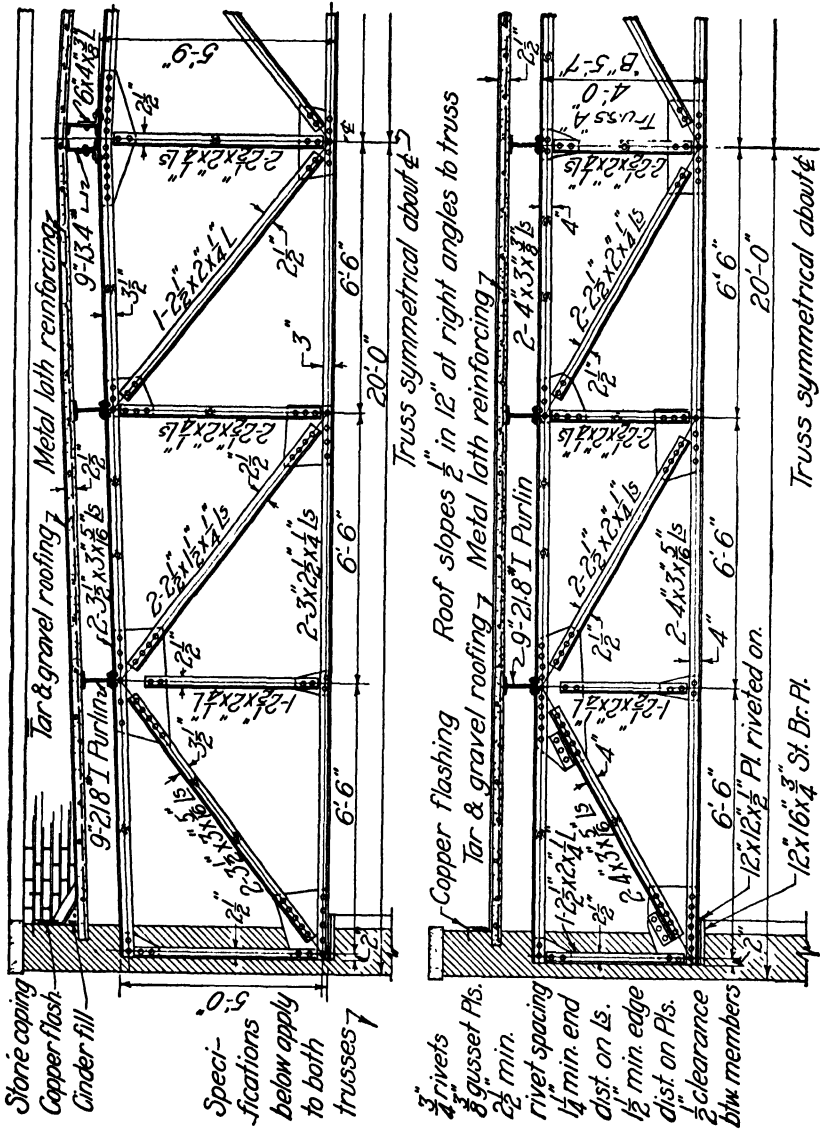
Truss details for building shown in Figs. 23 and 24 Chap. XXI.
